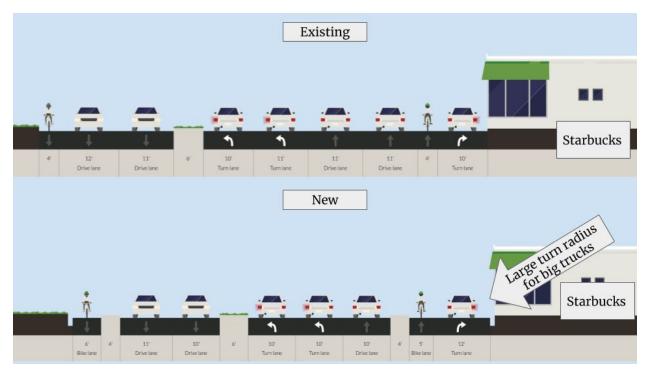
Current existing and new proposed recommended dimensions of Water Street at the Water and Ocean intersection. Graphics developed using Streetmix.
